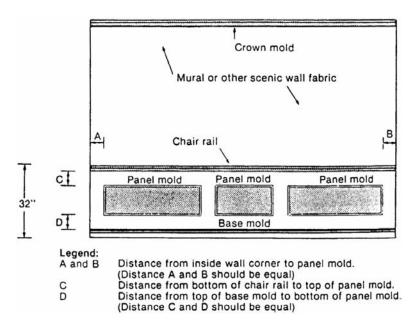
Wall molding placement. (From Jackson, 1987.)
